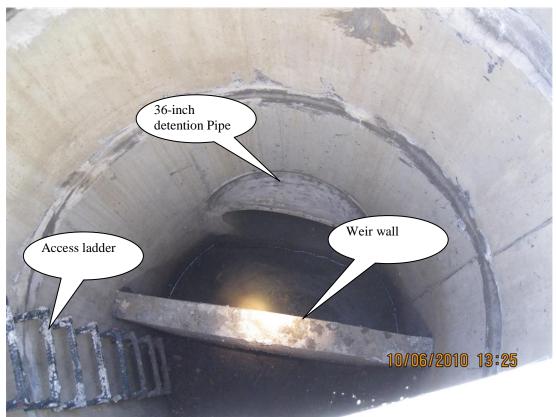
72-inch diameter manhole (Point B) midway between two each 36-inch detention tank/pipes. This manhole contains a 4-foot high baffle.
